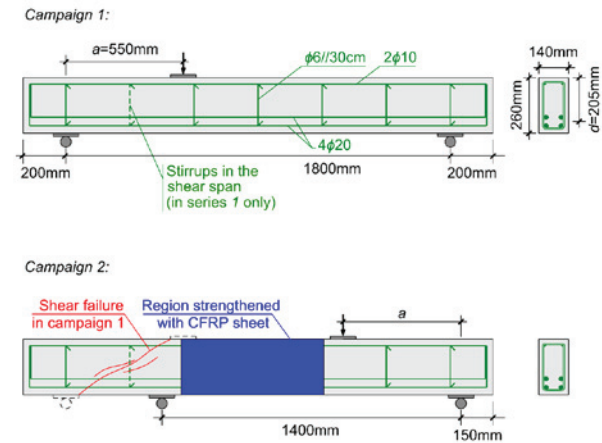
Specimen's geometry and test layout in campaigns 1 and 2.
